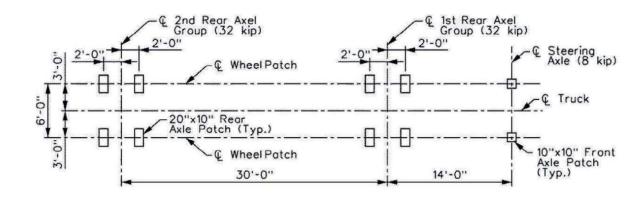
Refined Design Truck Footprint for Fatigue Design of Orthotropic Decks
